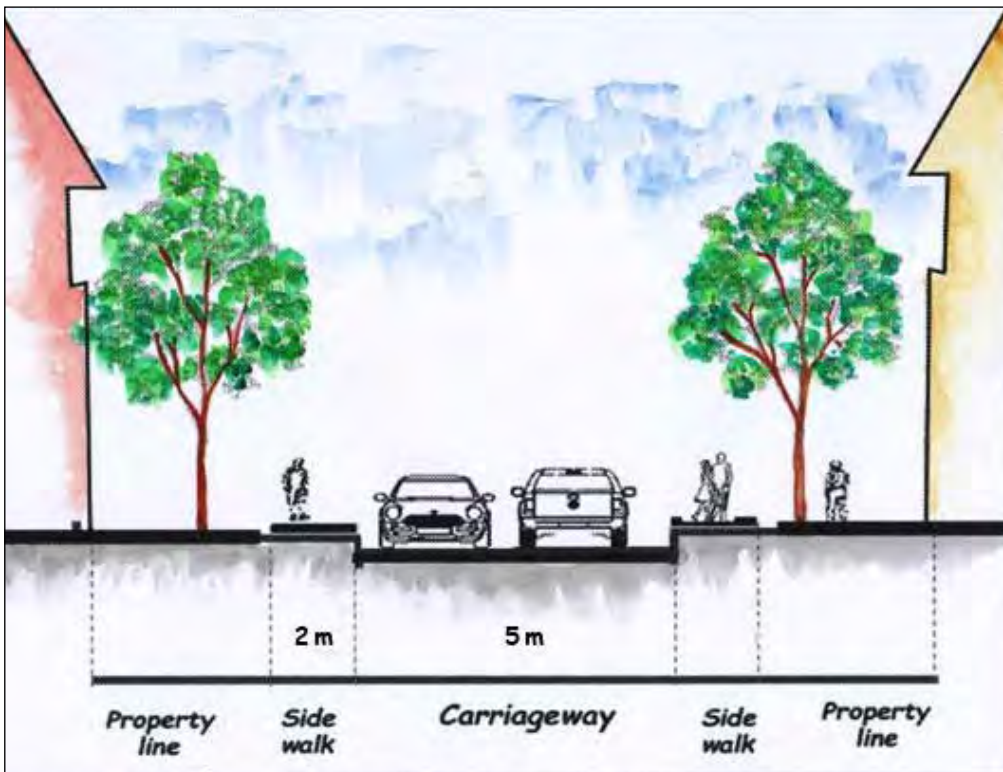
Cross section of the proposed roads widening in Tsunami resettlement area
